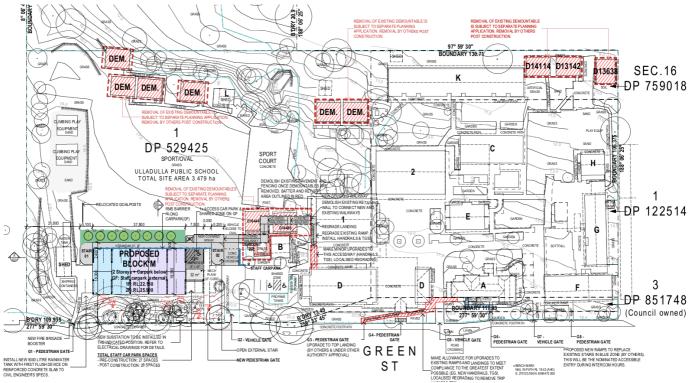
Site Plan (Source: Fulton Trotter, 2025)
